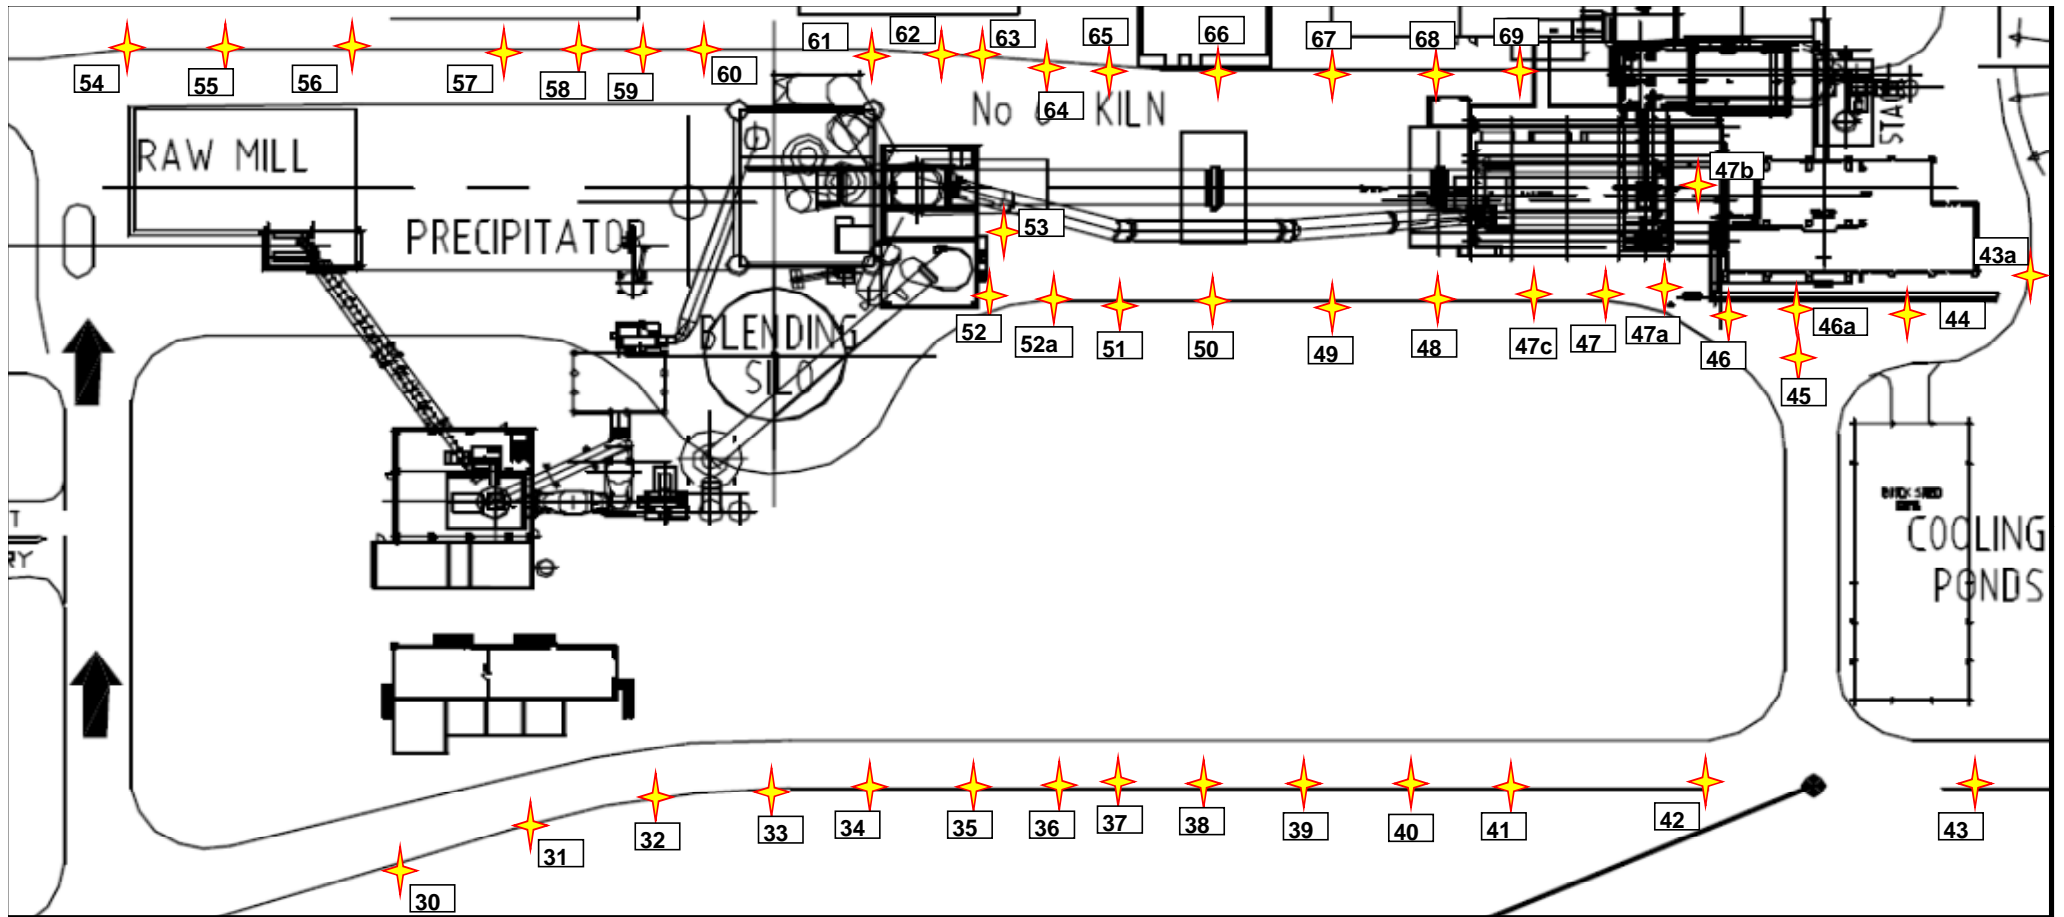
Kiln 6 Upgrade - location of new plant items
